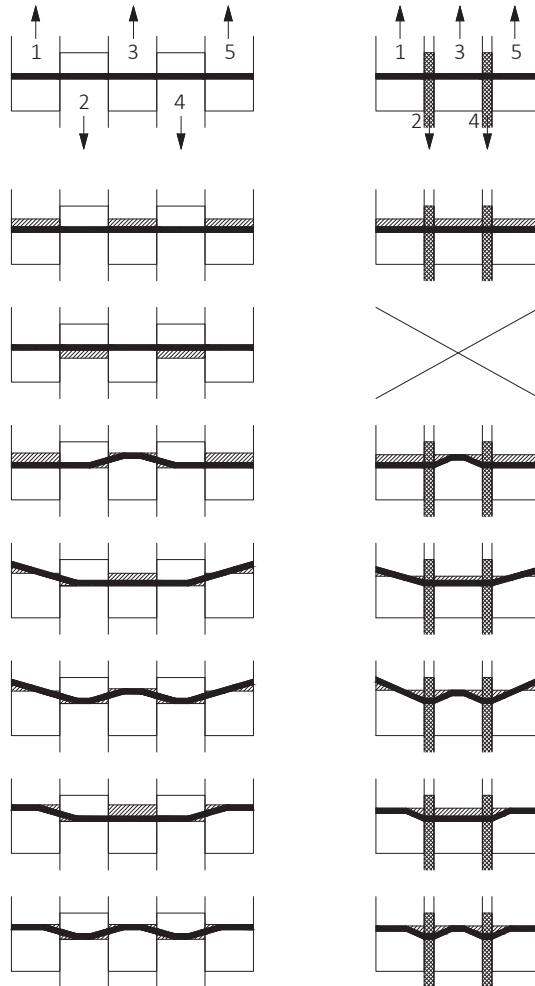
Failure modes of a fastener with four shear planes in a timber-to-timber (left) and a steel-to-timber connection (right).
